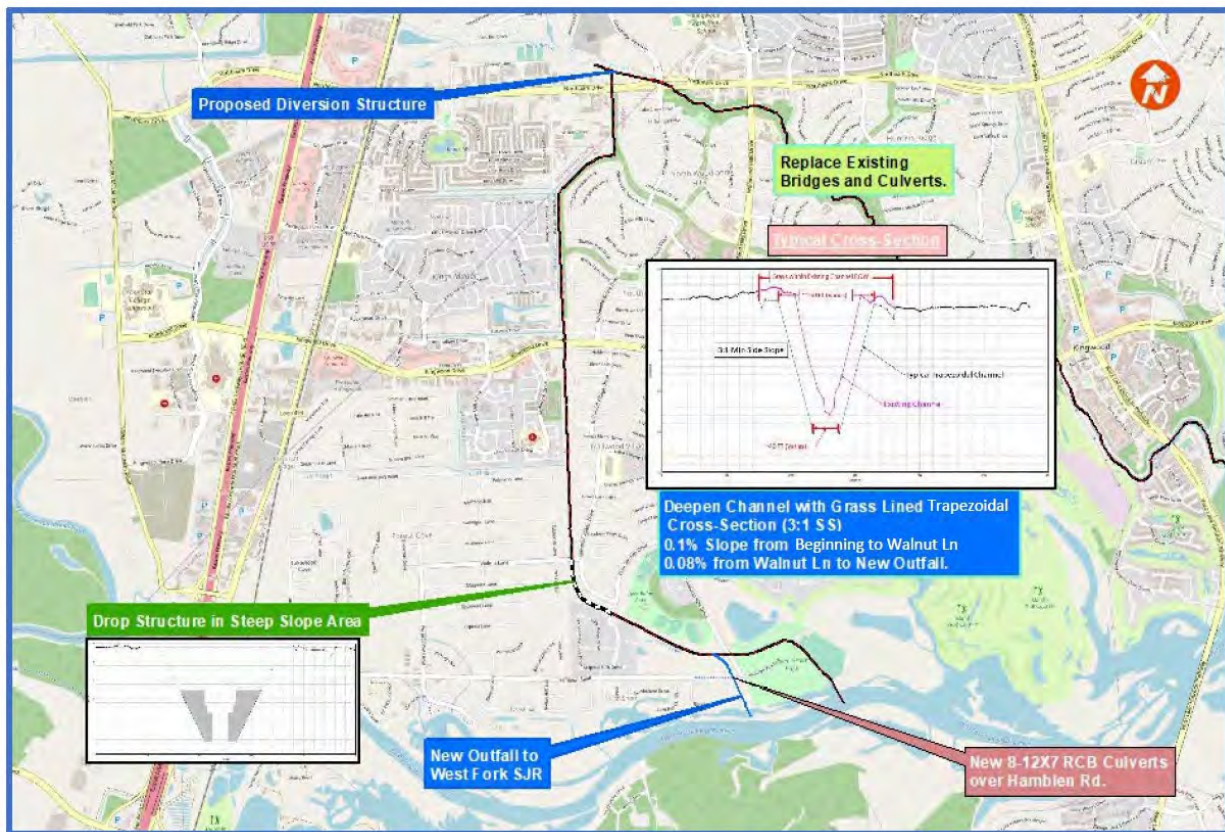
Alternative 1 - Trapezoidal Benched Cross-Section
